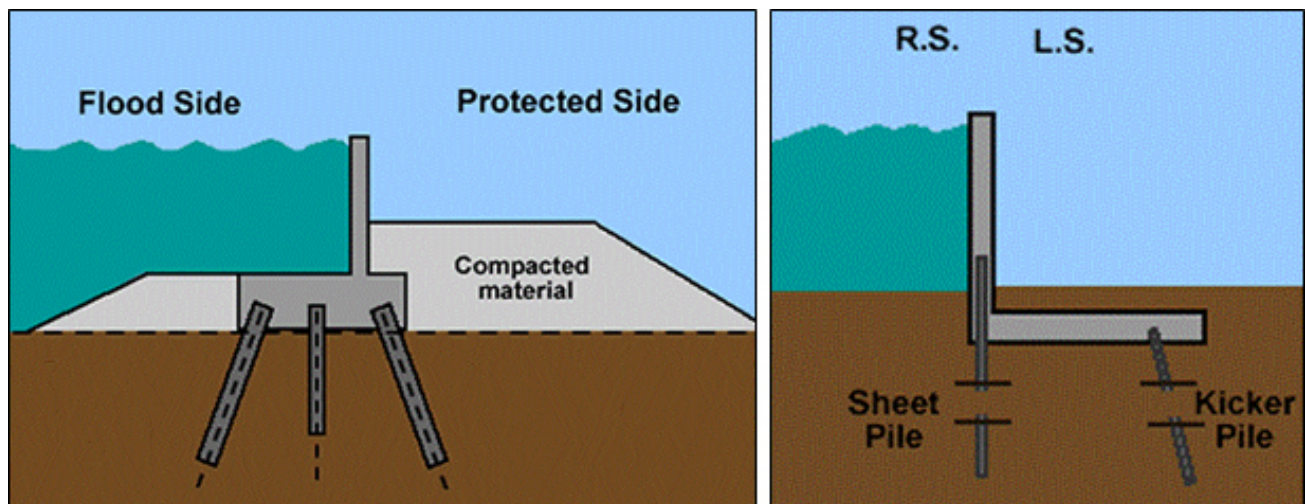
Typical (a) T-wall & (b) L-wall Sections
